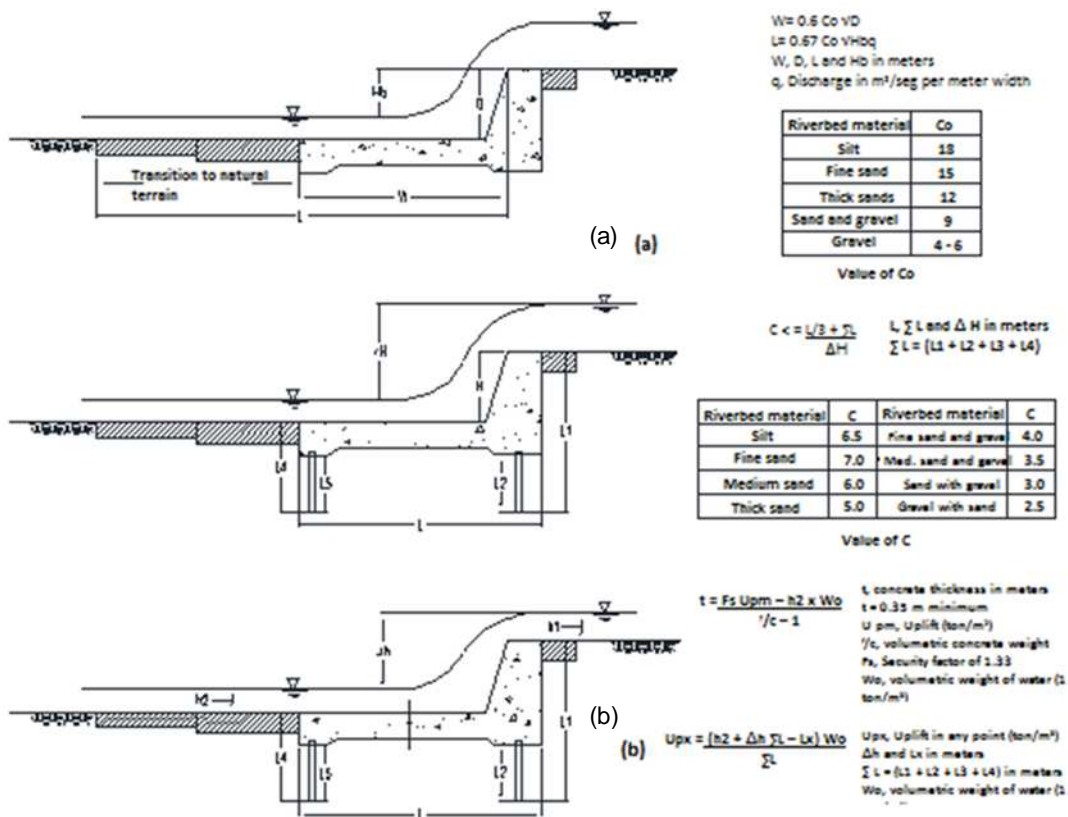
Proposed types of indirect protections through grade walls (a) Grades for beds of firm or rocky soils; (b) Grades with piles for beds with loose soil (sand or gravel) (SPOP, 2014)
